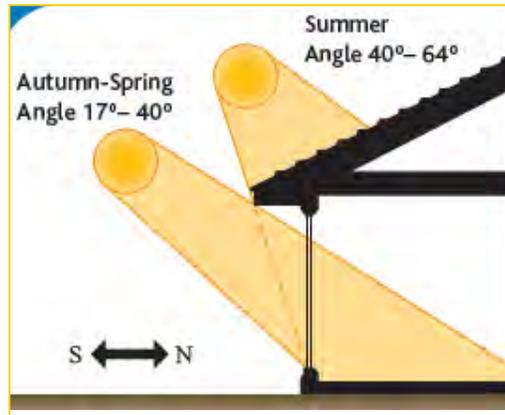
A simple overhang can provide shading on south facing windows (The Concrete Centre)
